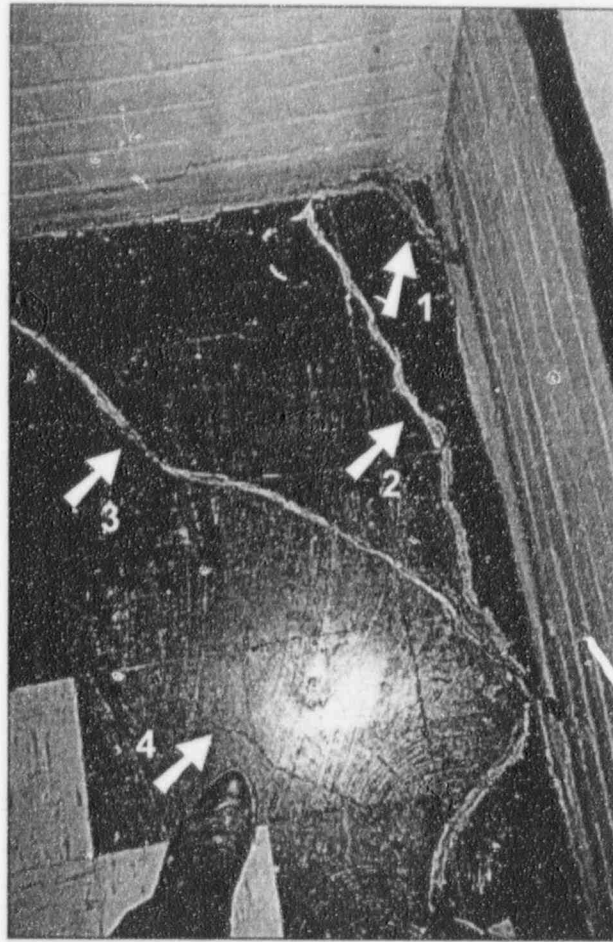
Cracked second floor slab at southeast corner wall.
